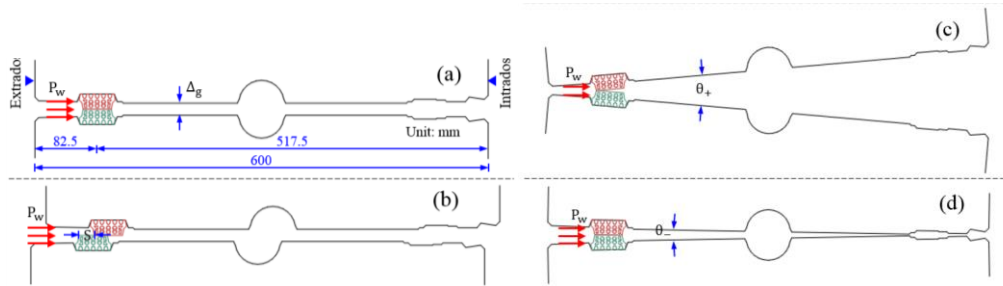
Typical failure modes of joint waterproofing (Gong et al., 2019)
